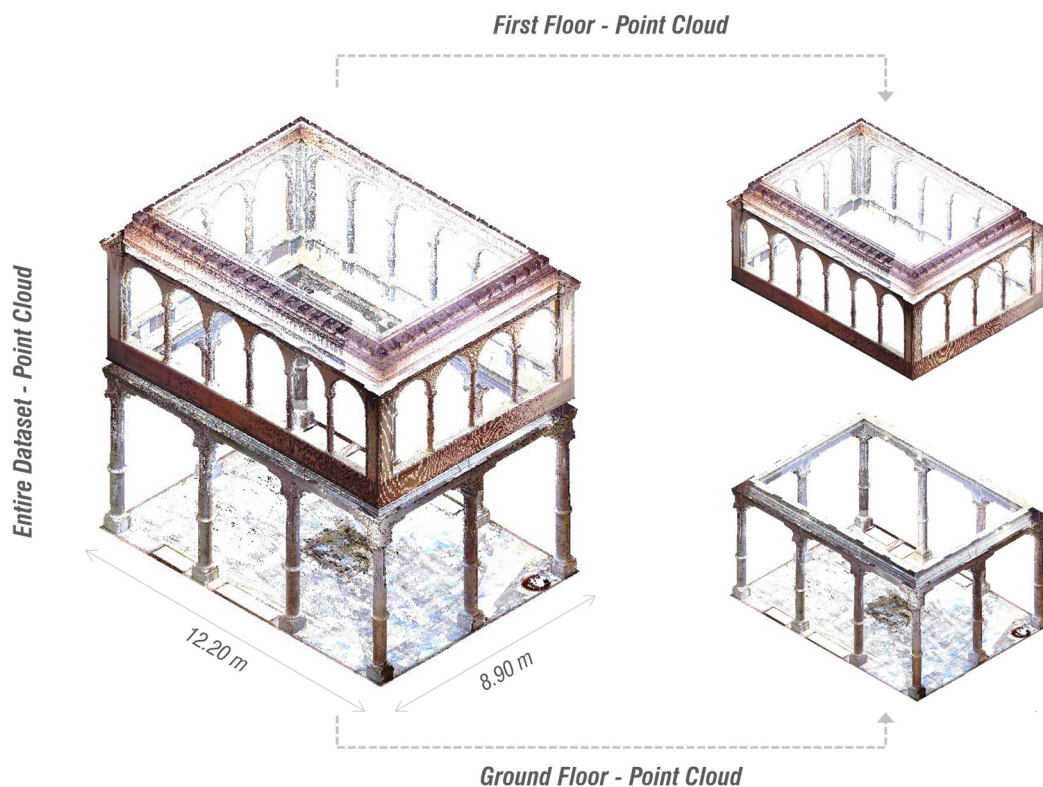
Subdivision of the complete point cloud into two groups: ground floor and first floor.
